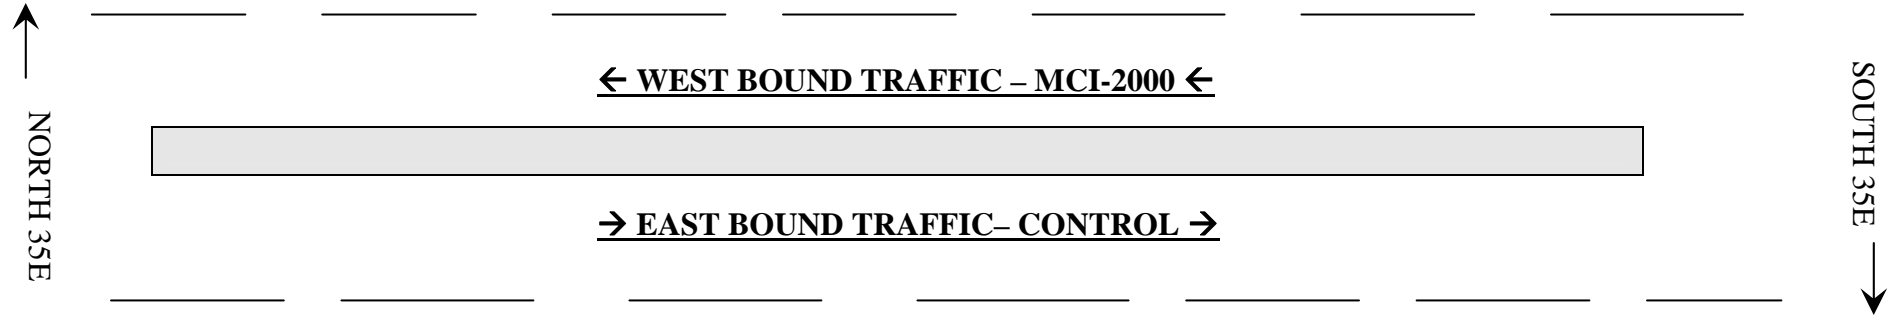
Location of Rebar on Randolph Street Bridge
